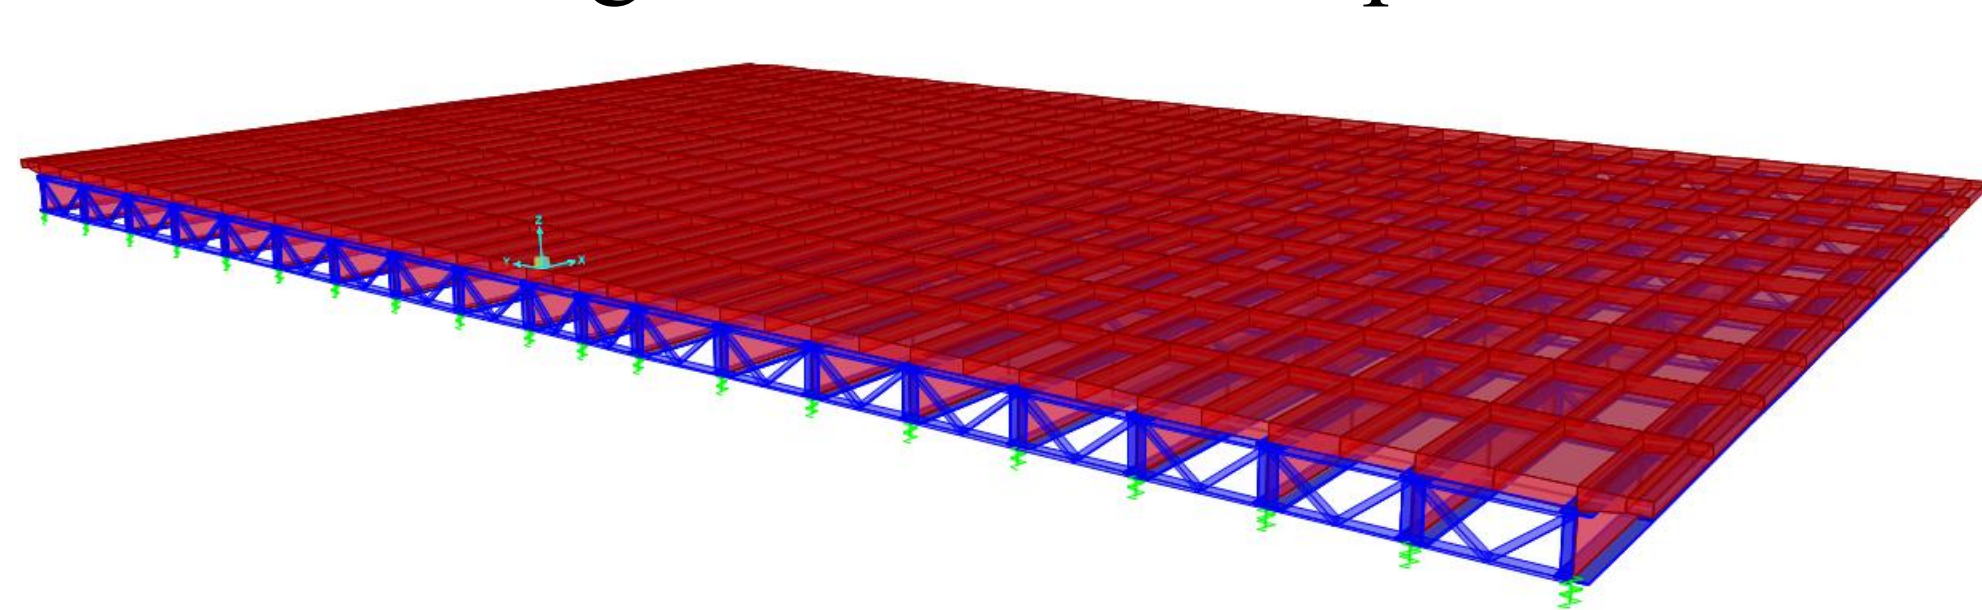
Fully modeled bridge superstructure with controlling moments demand found in interior girder 17.
